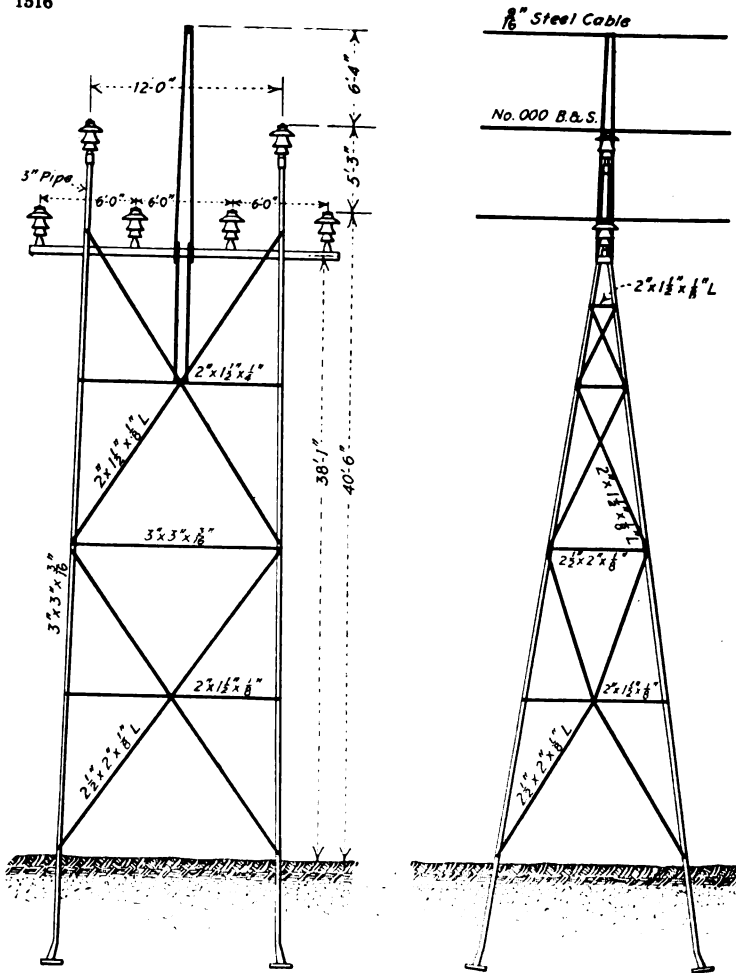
MEXICAN LIGHT AND POWER CO., LTD. CONSTRUCTION OF
